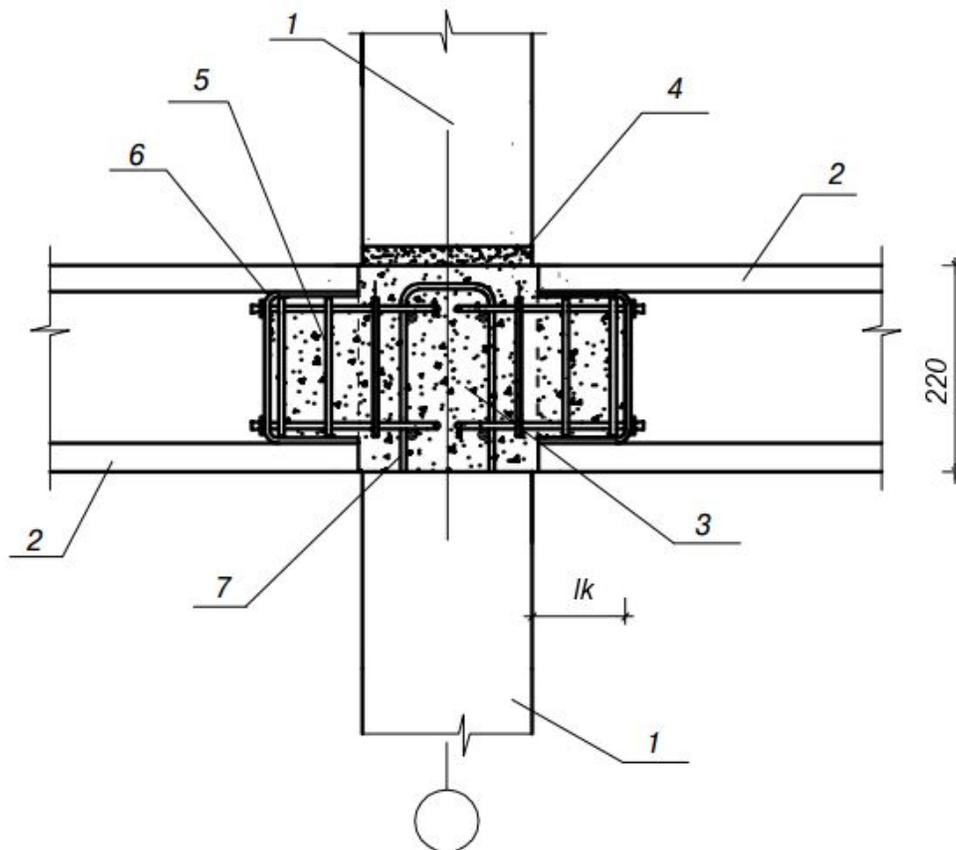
Combined joint of multi-hollow slabs with wall panels:
